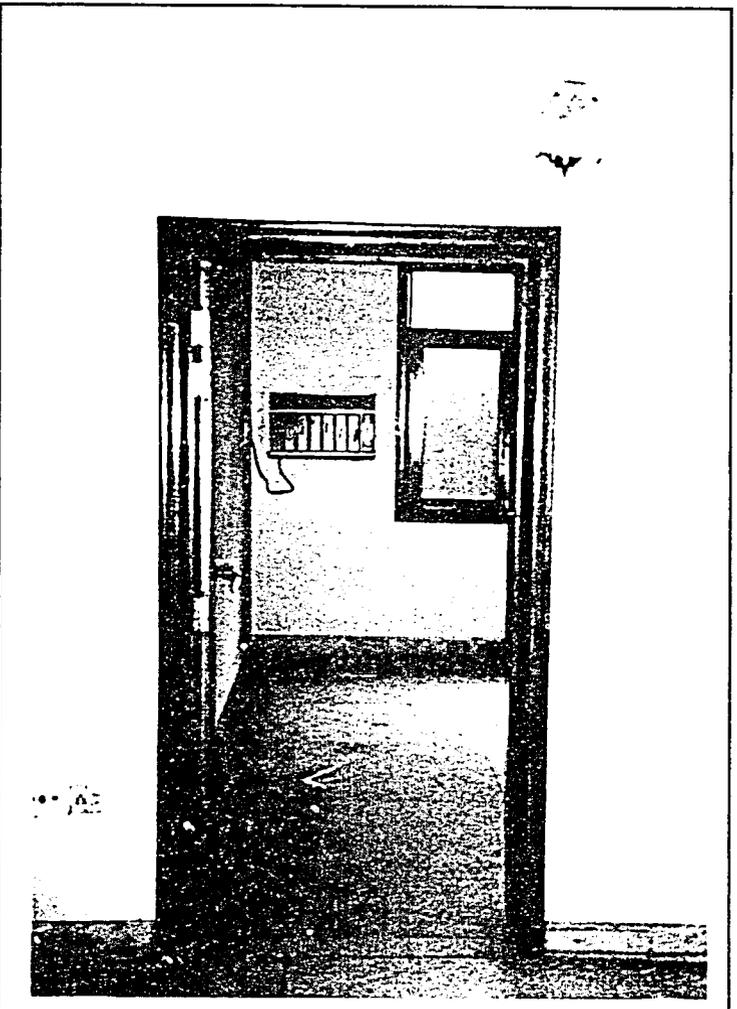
Peshawar HRD Office Facility. Staircase in West end of building. Cable to Phone No. 3 to be routed down staircase to ground floor.
